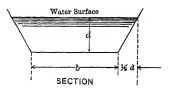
(Part 1 of 3).—Hydraulic Elements of Trapezoidal Sections.
